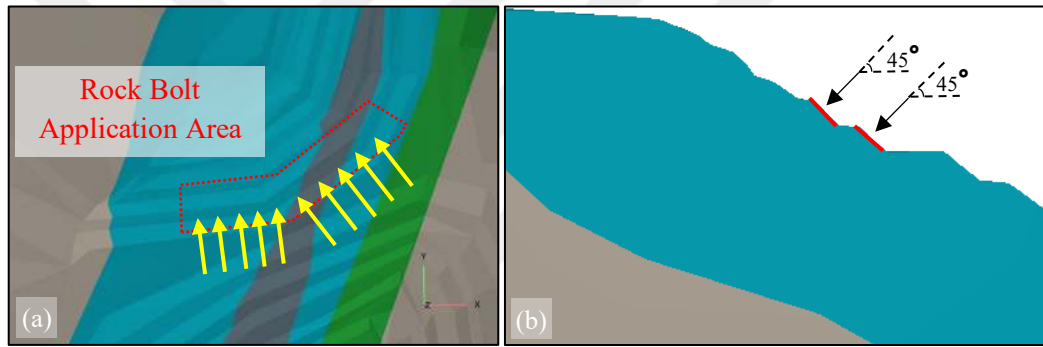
Rock bolt application area and their design of construction in plan (a) and profile view (b)
